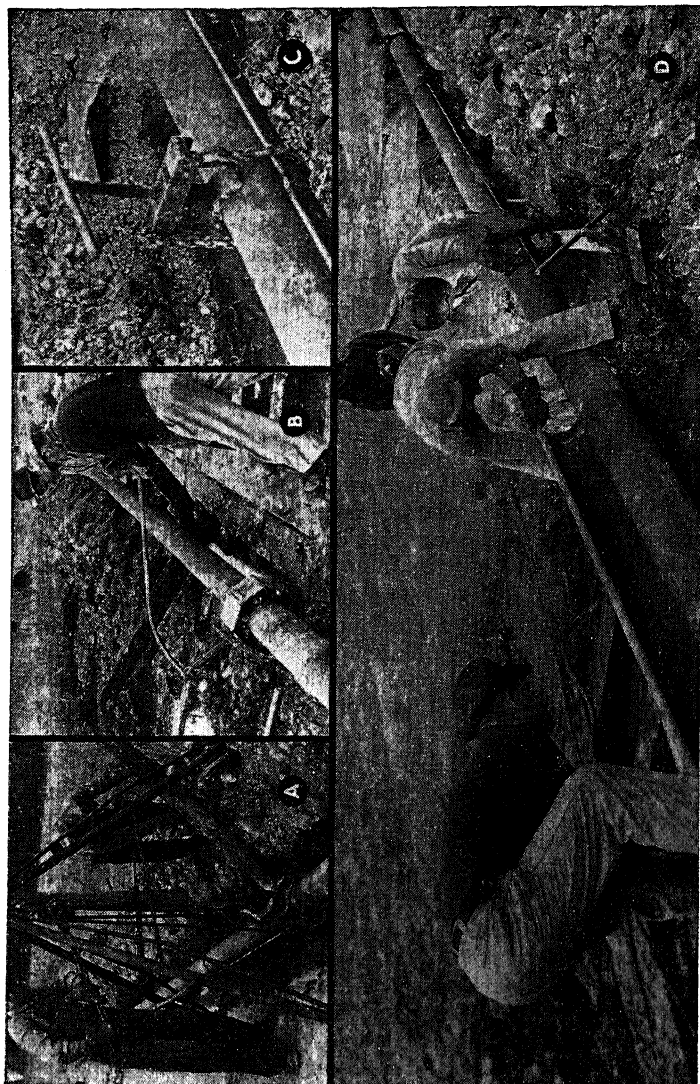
Reconditioning a 10-inch oil line in southeast Texas. About 20 years old. Many corroded spots leaked. Steps required: 1. Digging out oil line. 2. Lifting line (See A). Supported on timber. 3. Cleaning corroded section (see B). 4. Fitting on new steel plates with shock welded clamp (see C). 5. Tack welding plate in place. Finish welding (see D). 6. Painting and wrapping. 7. Relaying line. — Half section of $\frac{3}{4}$ -inch rolled plates applied half way or full way around pipe, depending upon extent of corrosion. Welded with two passes $\frac{3}{16}$ -inch and $\frac{1}{4}$ -inch Type A shielded arc electrode.
